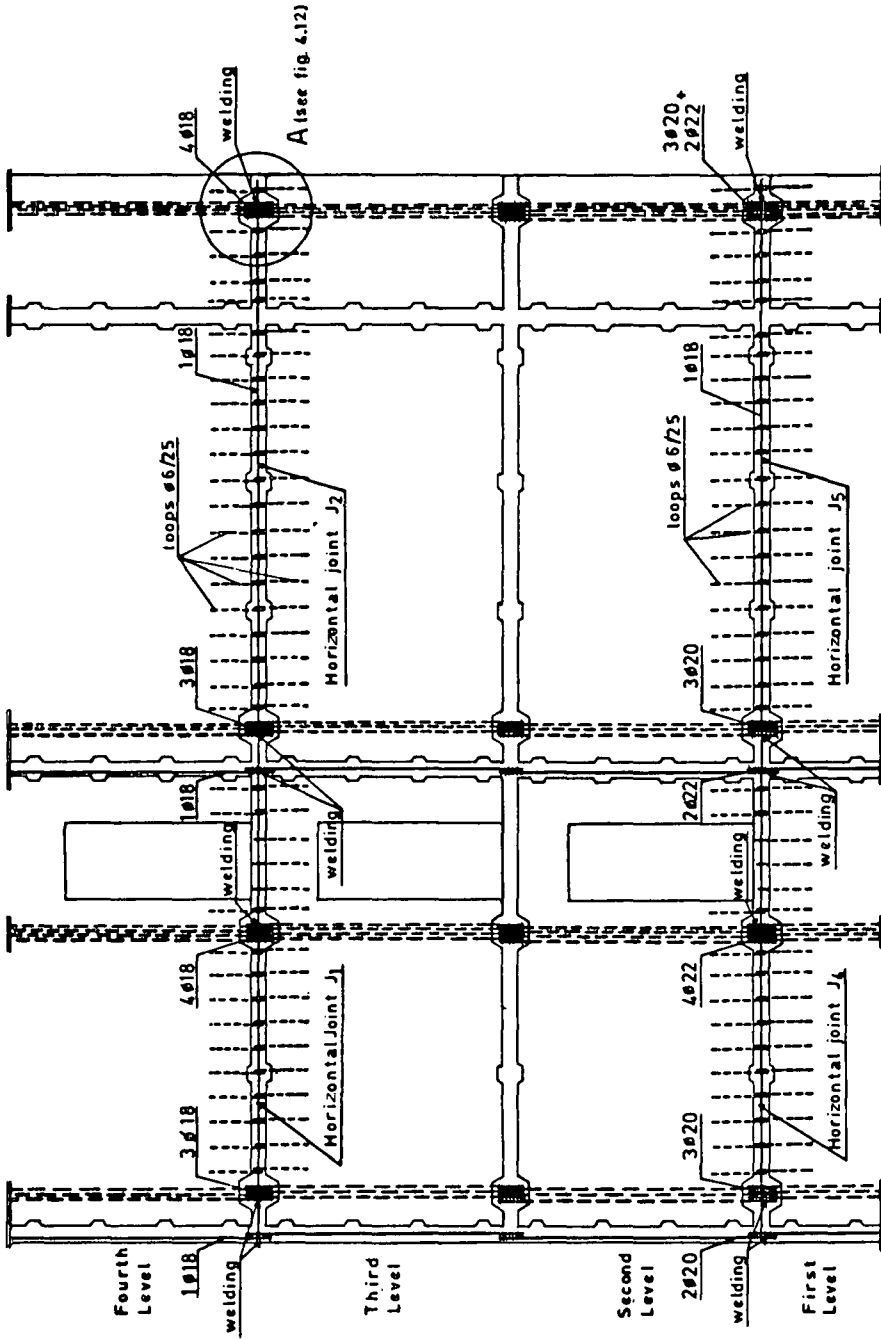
Reinforcement of the horizontal joints J₁, J₂, J₄, J₅ only
